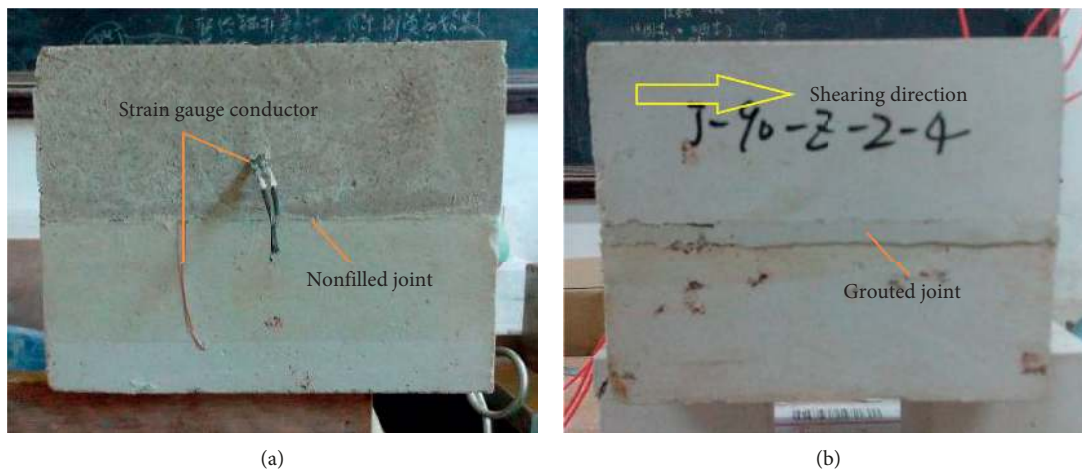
Joint sample. (a) Bolted nonfilled joint. (b) Bolted grouted joint.
